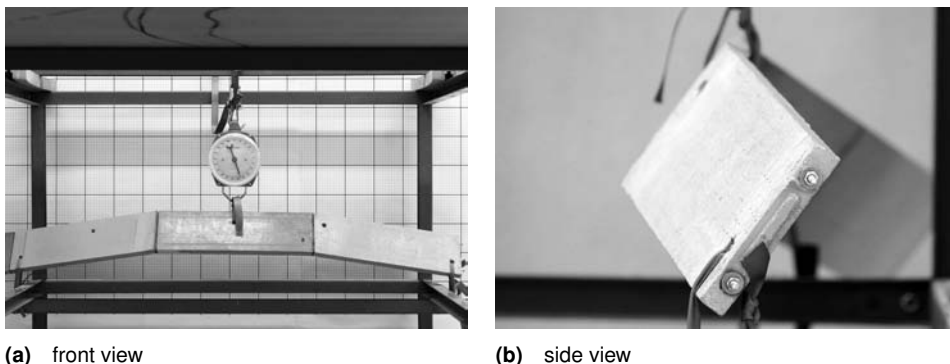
Load testing of a simply supported beam {appr01_vert_1b} assembled with prefab elements. Displacement figure of the connected system is bending out of plane, thus stability failure
